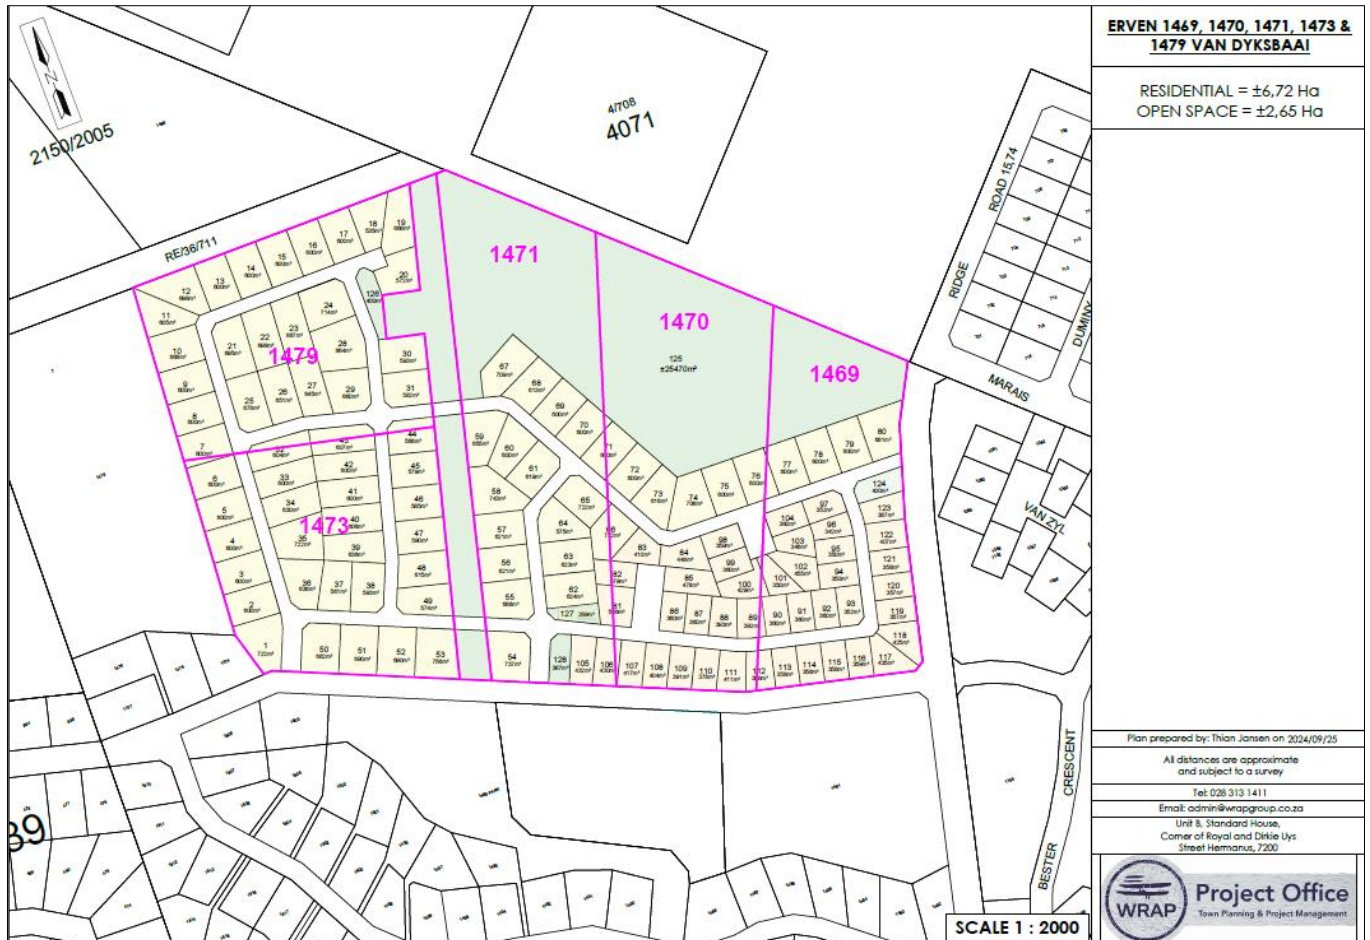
Proposed Site Development Plan for Erven 1469, 1470, 1471, 1473 & 1479 Van Dyksbaai
